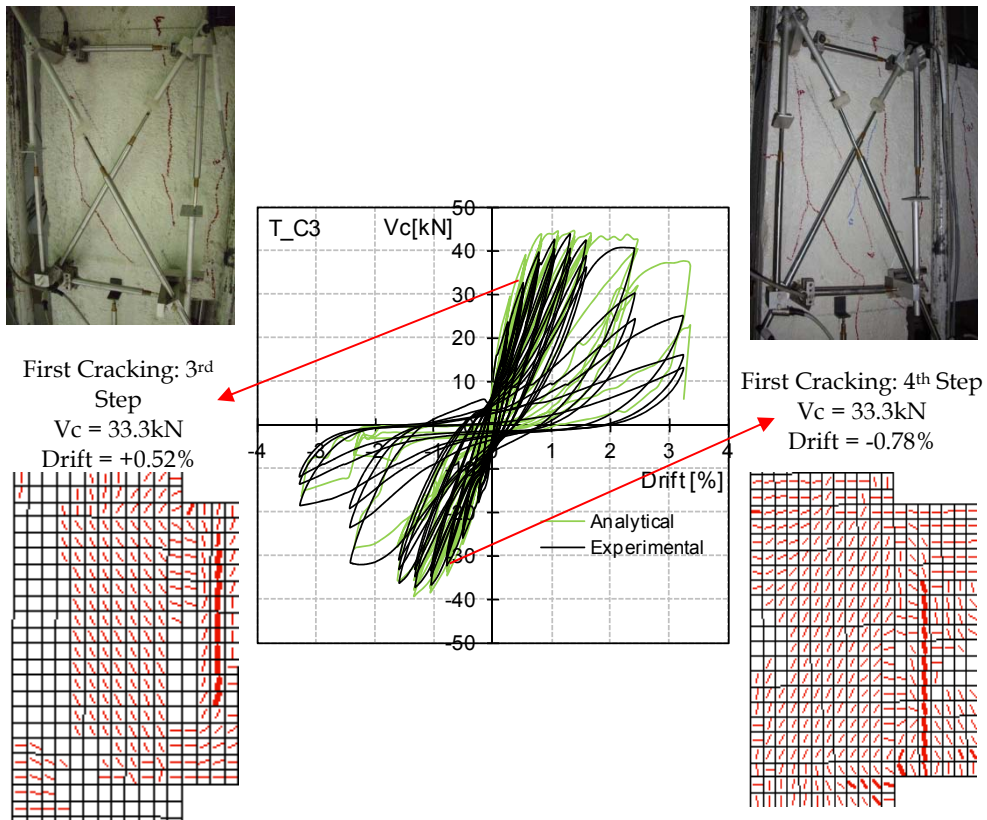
Experimental and analytical crack patterns at the joint panel first cracking (Crack widths: thin <0.5mm; thick >1mm).
